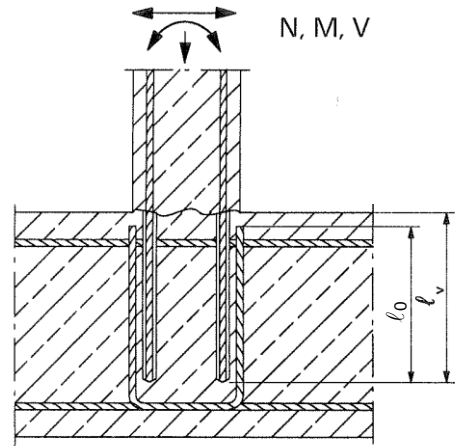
Rebar connection for components stressed primarily in compression. The rebar is stressed in compression
